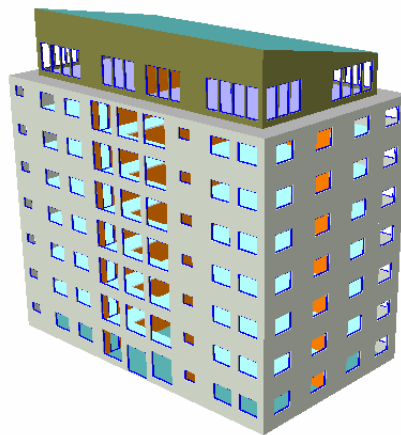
Three-dimensional view of seven-storey office building with a penthouse
